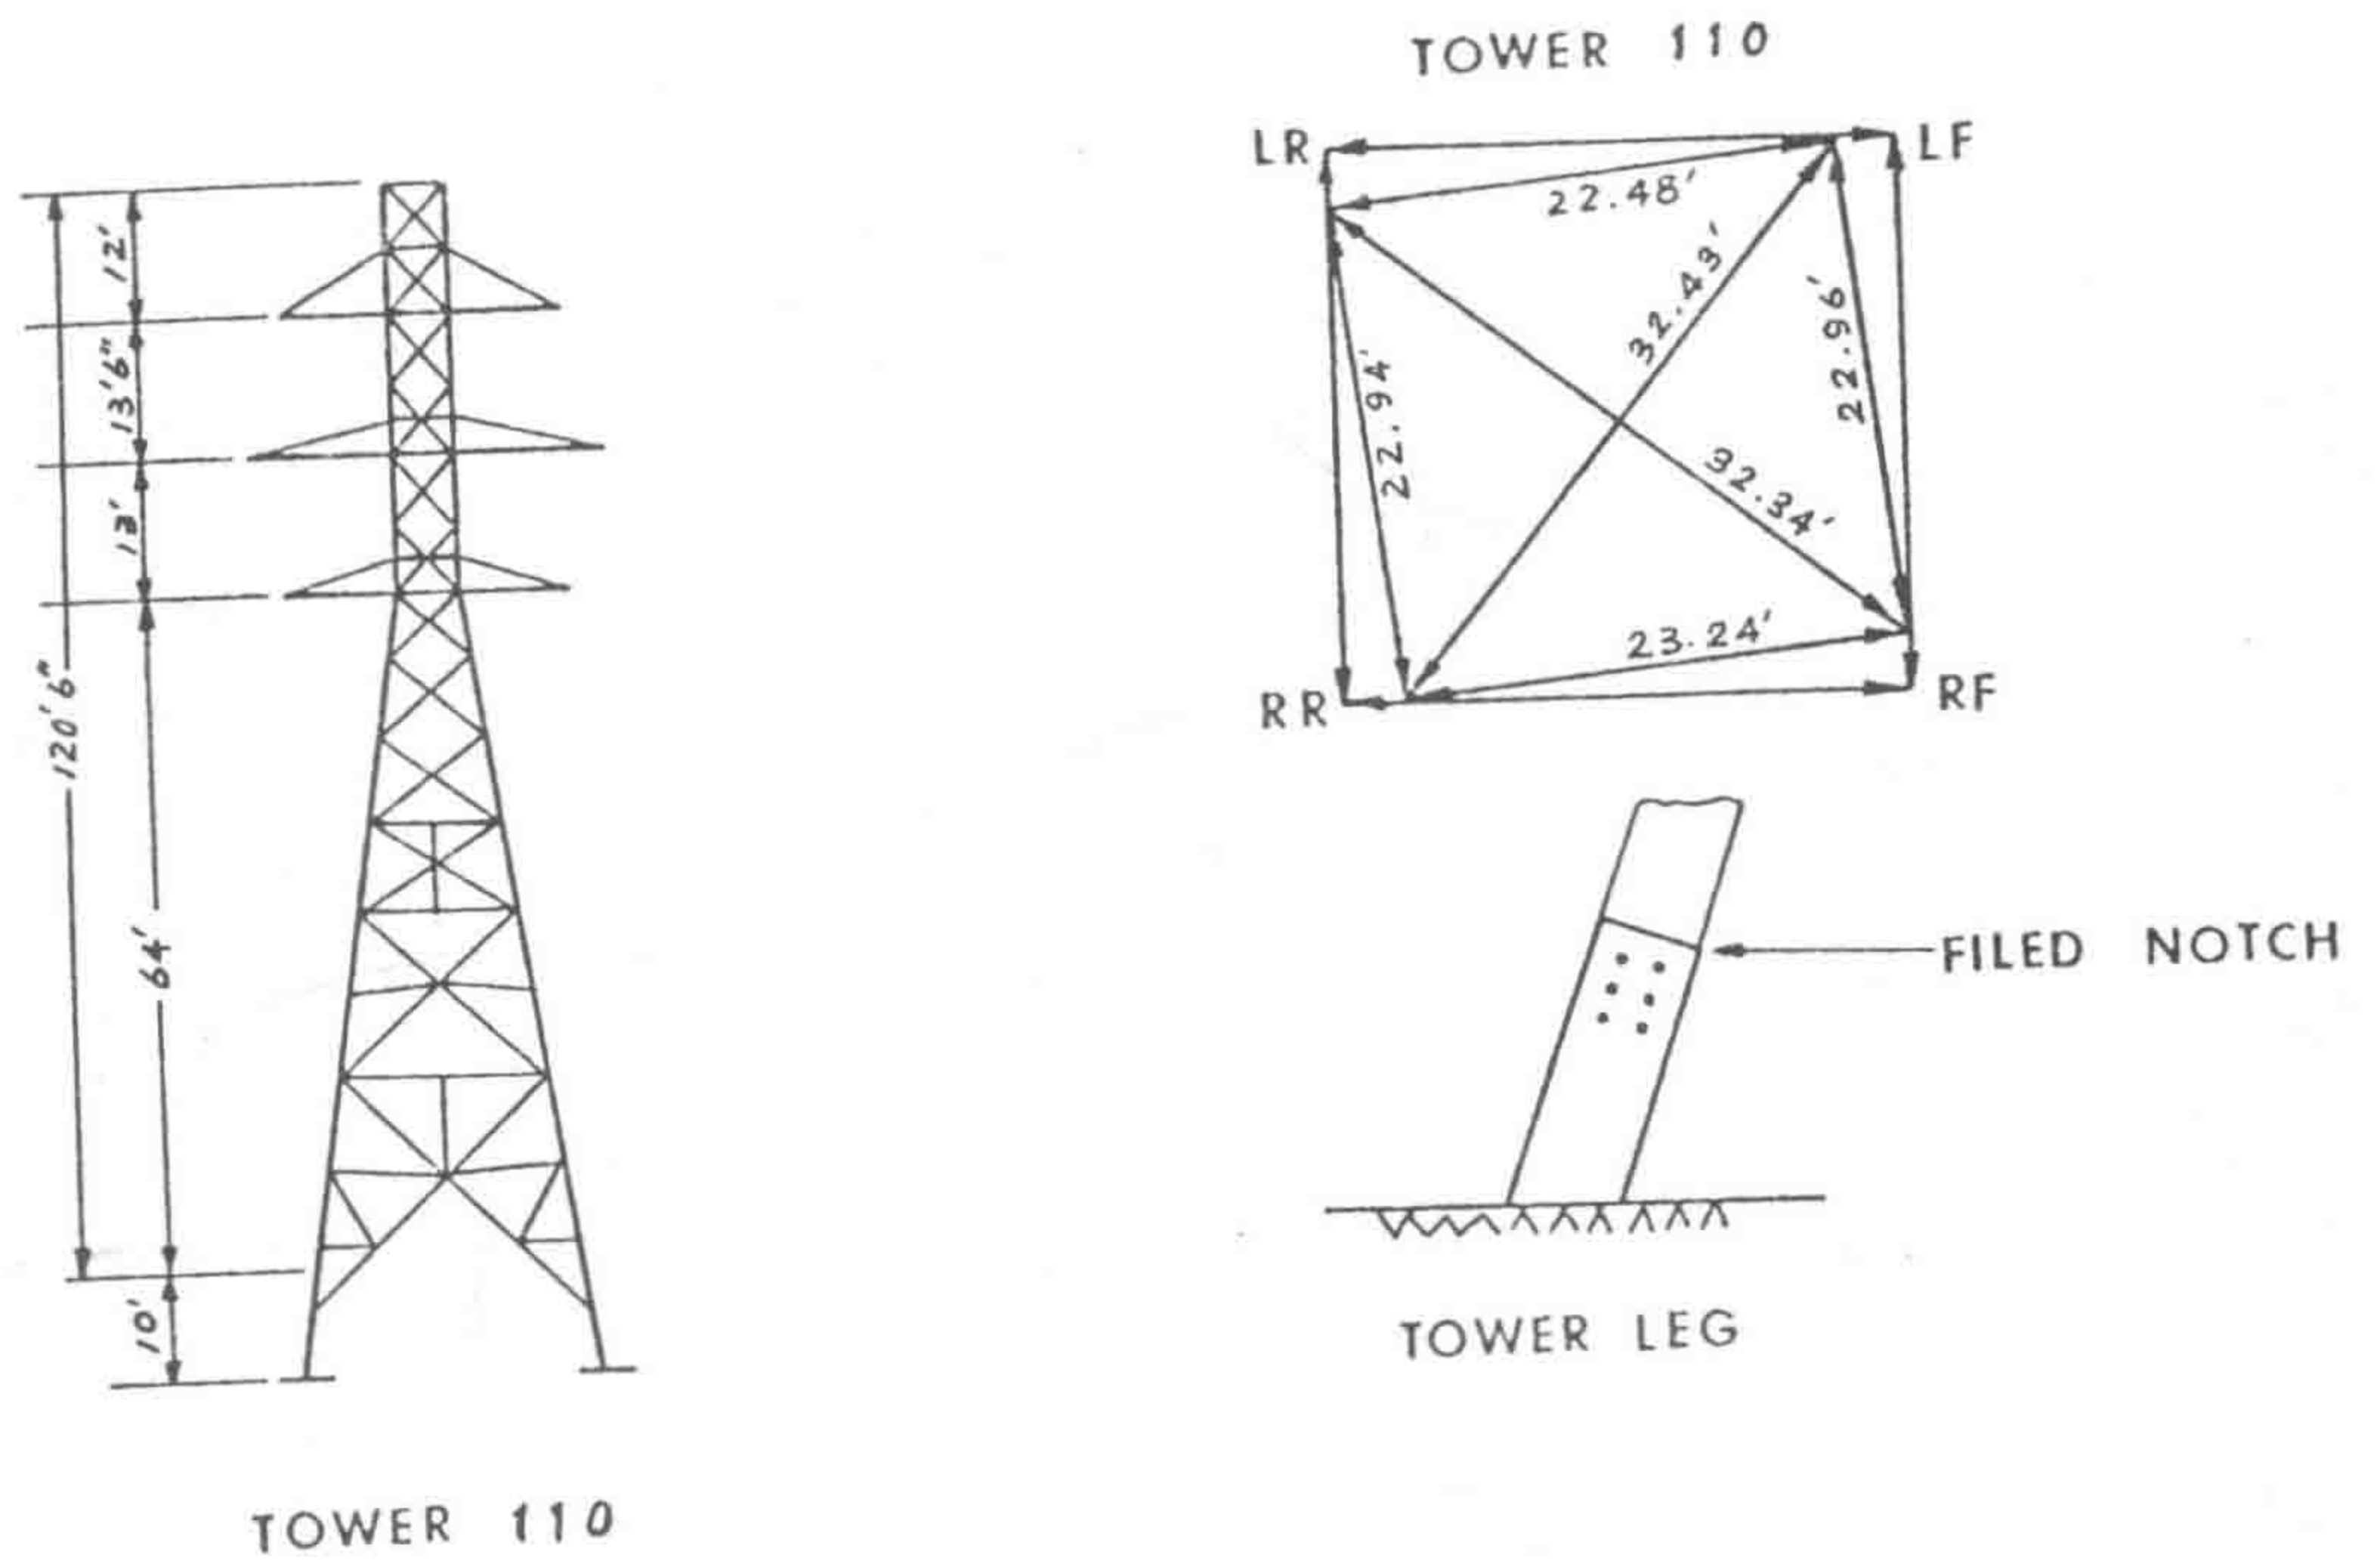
Cross-sectional View of Angle Tower and Subsidence Monitor Plans
